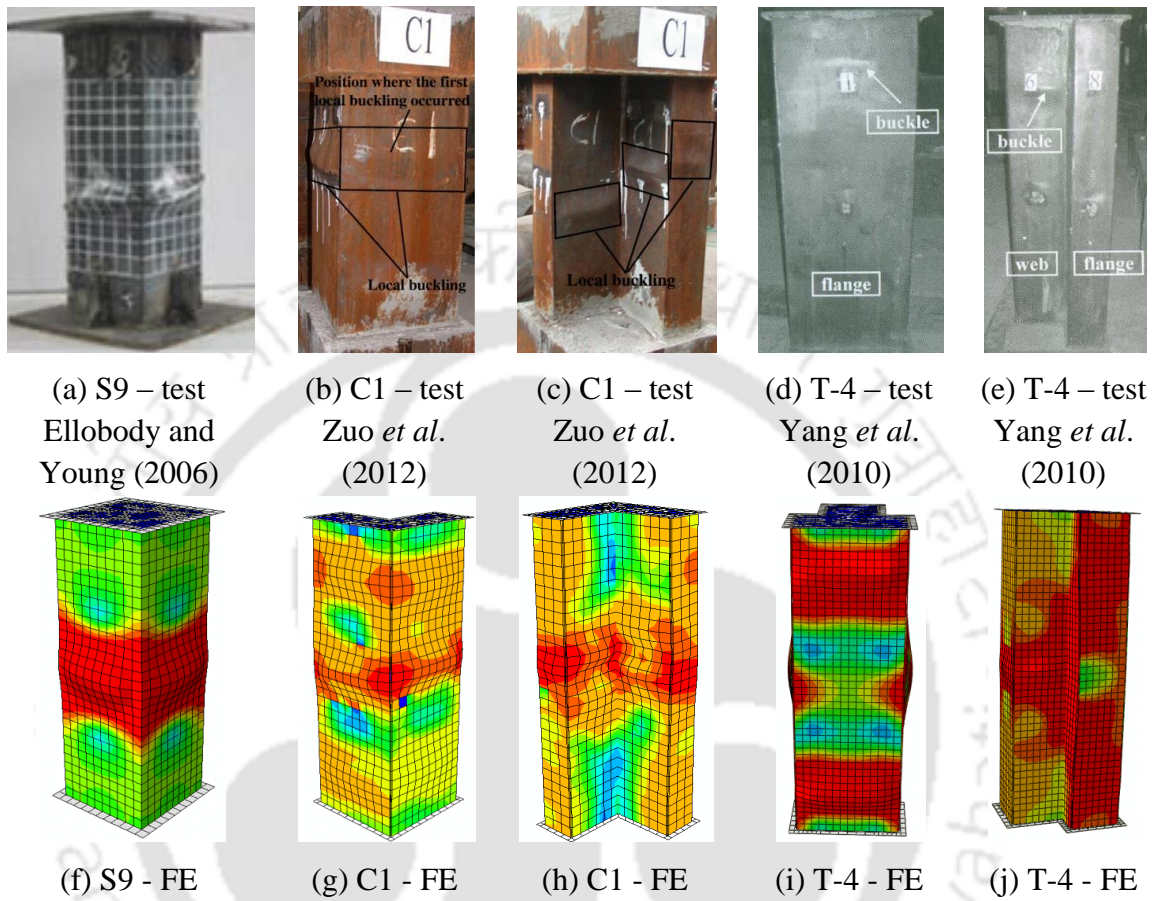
Comparison of the experimental and FE failure modes for the concrete-filled steel tubular stub columns.
